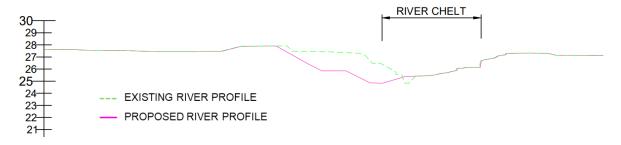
Cross-section of riverbank reprofiling proposed in Scheme design
